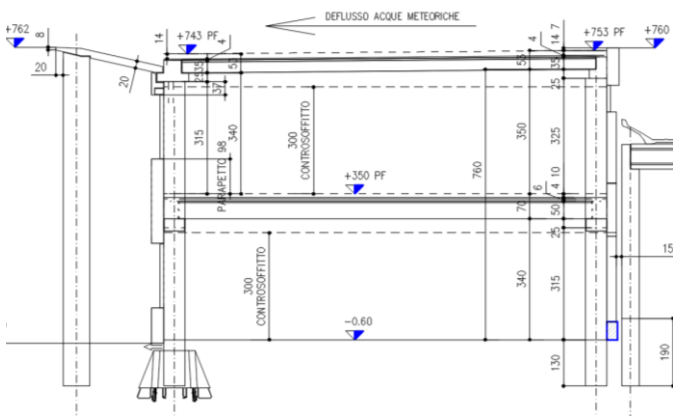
Building with colonnade cross section. / Sezione trasversale della palazzina con il colonnato.
